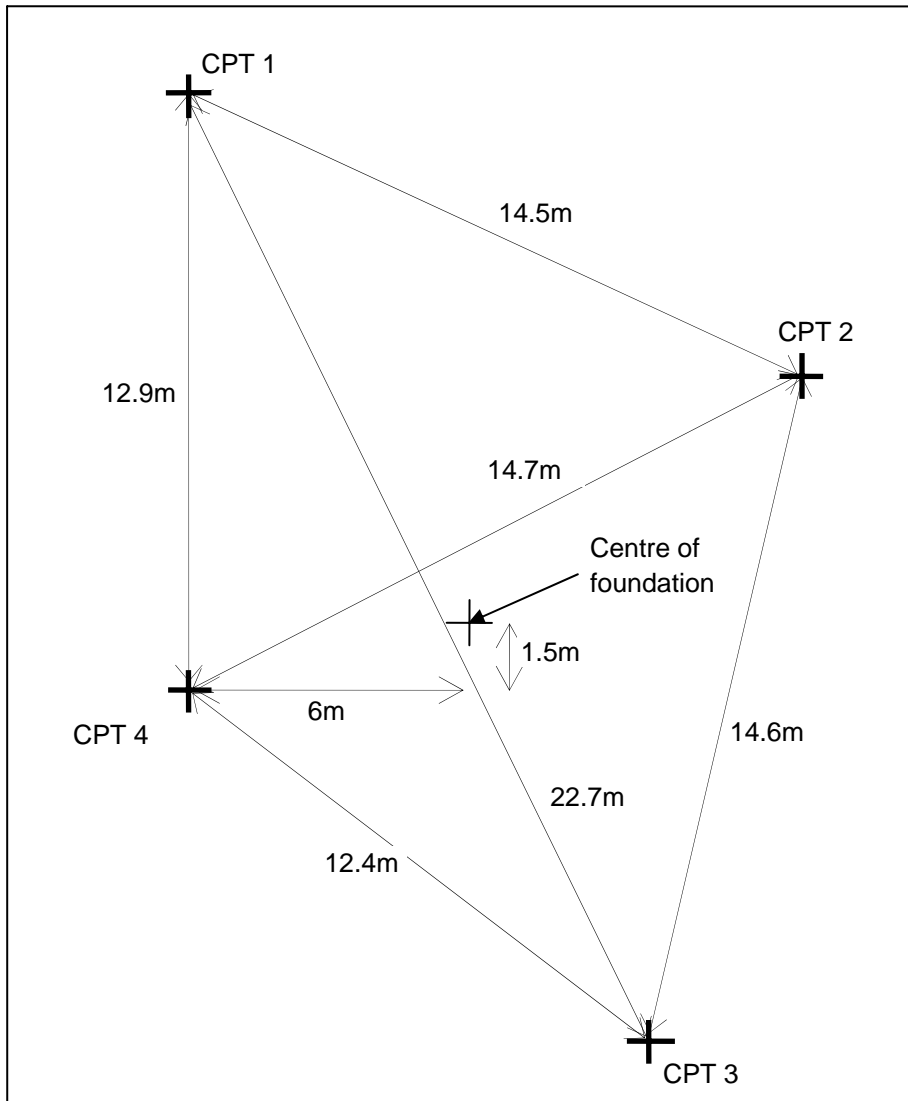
Example 2.1 Site plan and location of CPT tests
